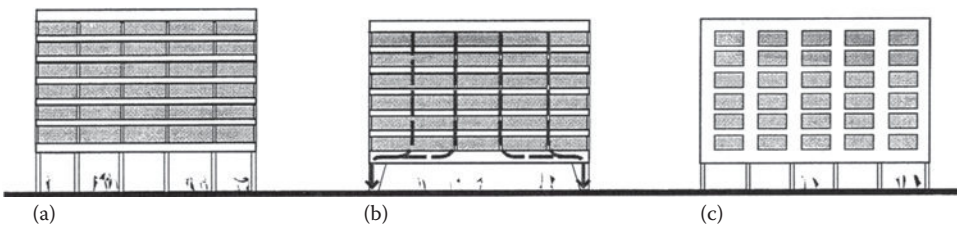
Three types of soft first story: (a) flexible first floor; (b) discontinuity, indirect load path; and (c) heavy superstructure.
